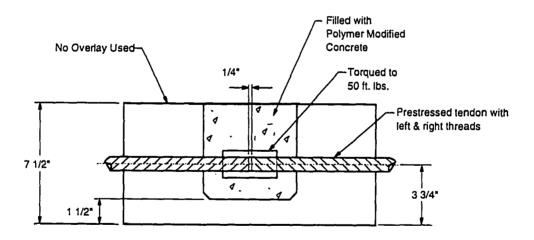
Transverse joint details, Milford, Montague Toll Bridge.
